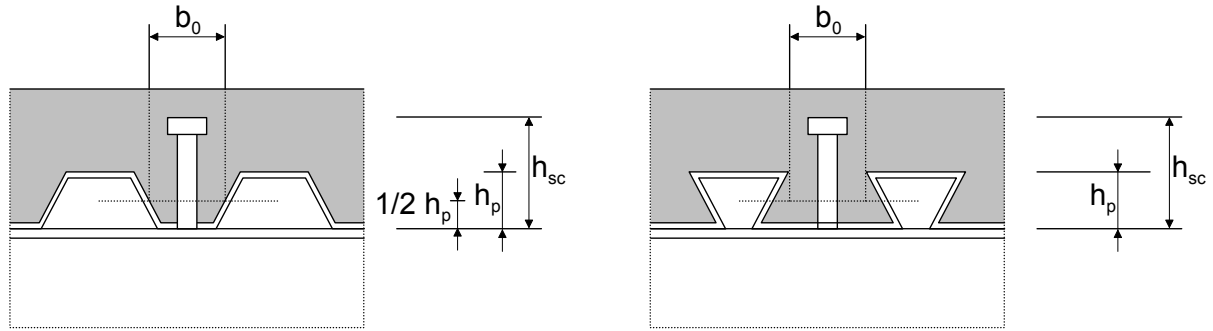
Scheme of a corrugated steel sheet perpendicular to the beam direction
